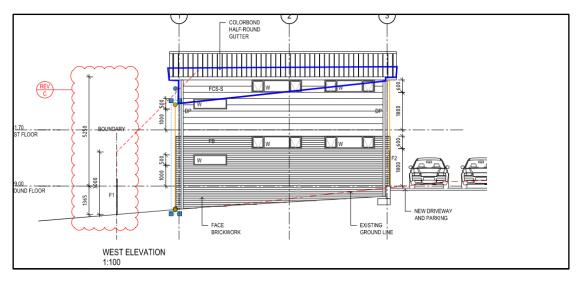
Graphic identifying the protrusion from the building envelope subject to applicant's proposed modification.
